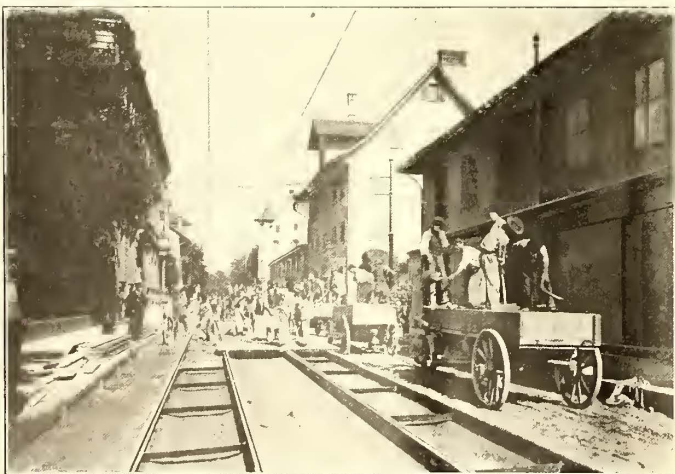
SECTION OF RAIL LAID IN ASPHALT
